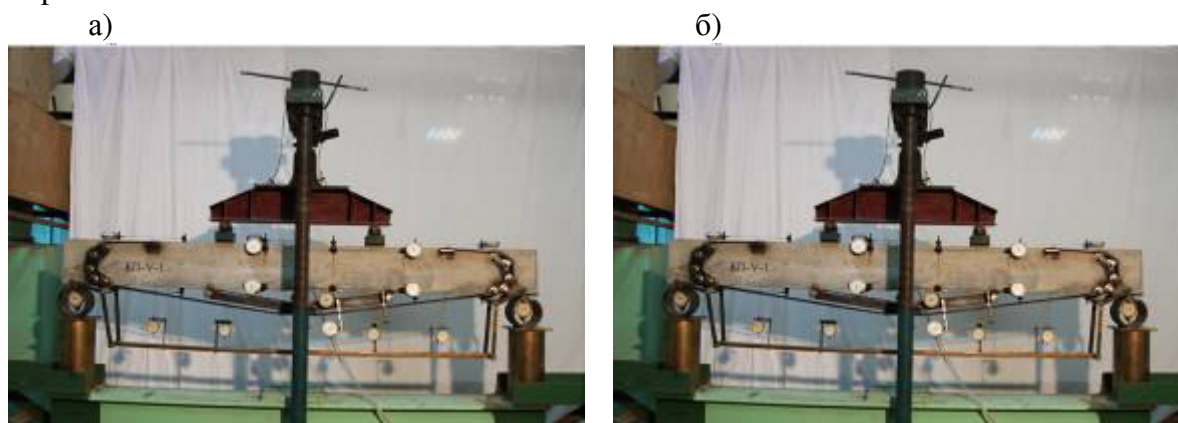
Testing of reinforced concrete beams strengthened with external steel wires of БП-V series including rigid levers – a , and of БП-VI series without levers - b
